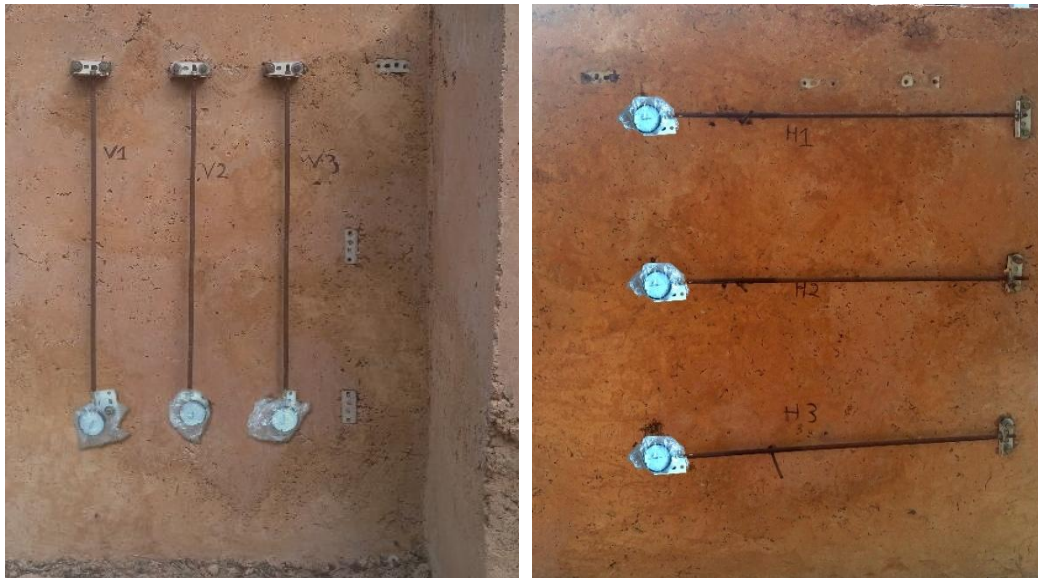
Reference images of measuring the shrinkage strain on Mud-Concrete wall
